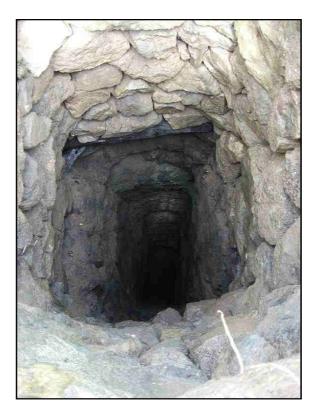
; Feature 15 (Shaft 7) showing wooden beam supporting ginging - looking north
